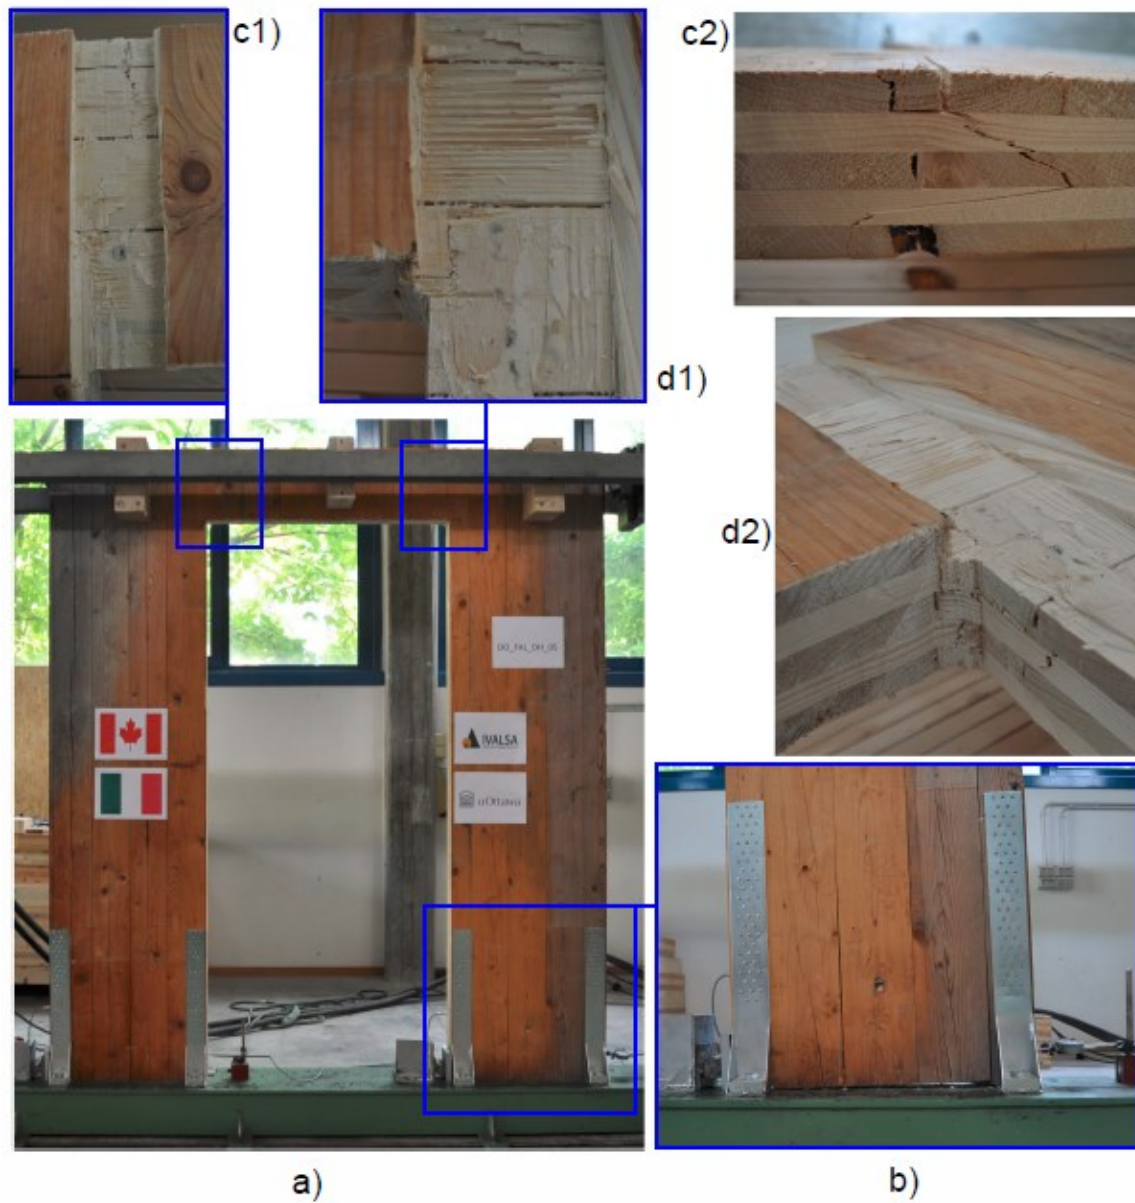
Failure mechanism achieved at the end of the test for specimen 05
